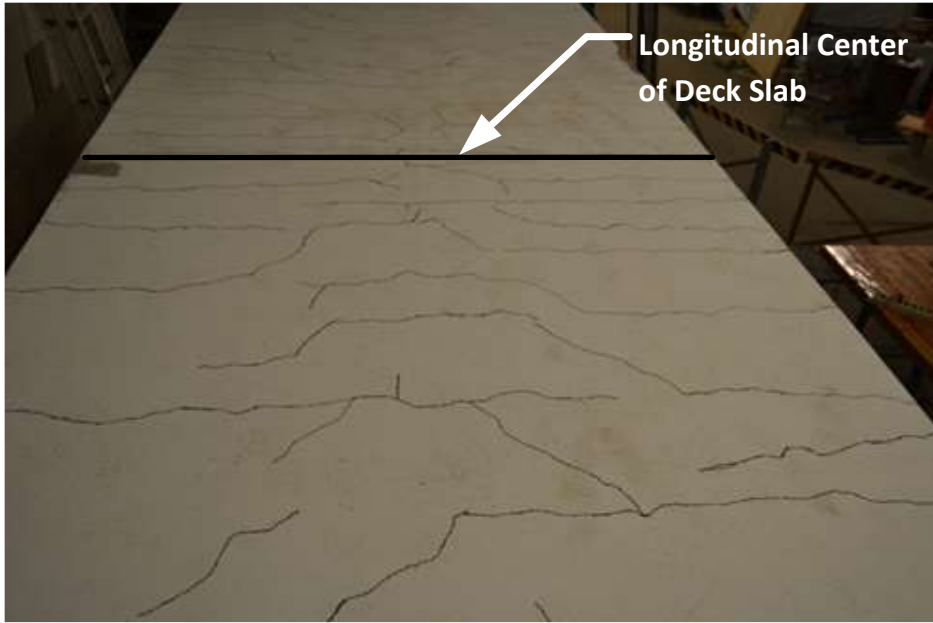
Final Crack Pattern in Top of Deck Slab (looking south)
